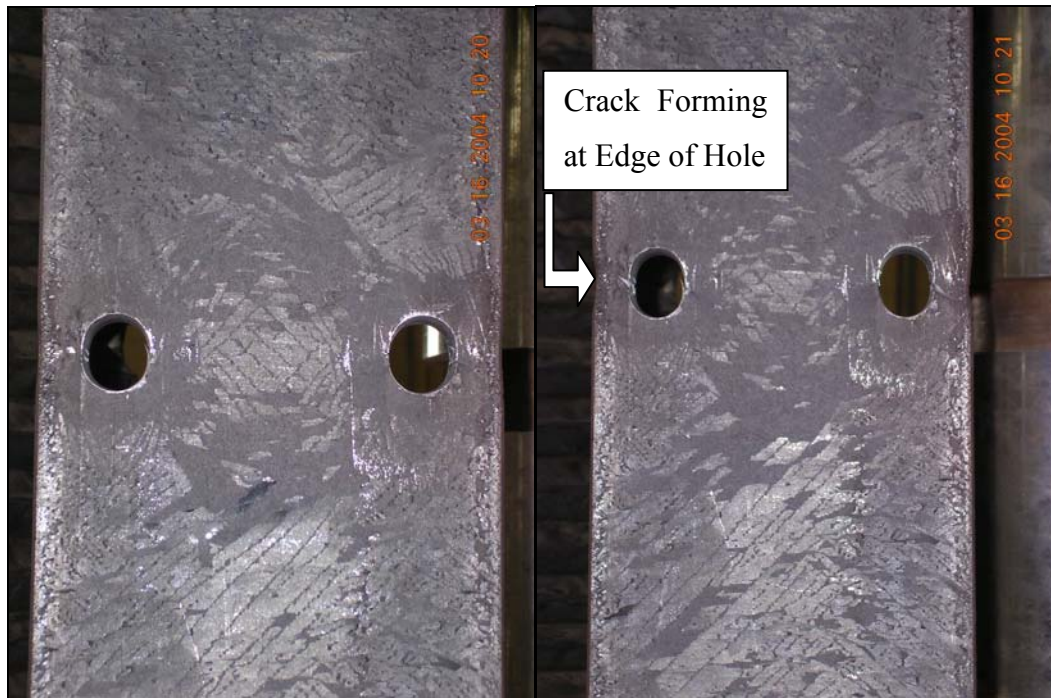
Punched Hole Specimen Yielding and Initial Fracture
